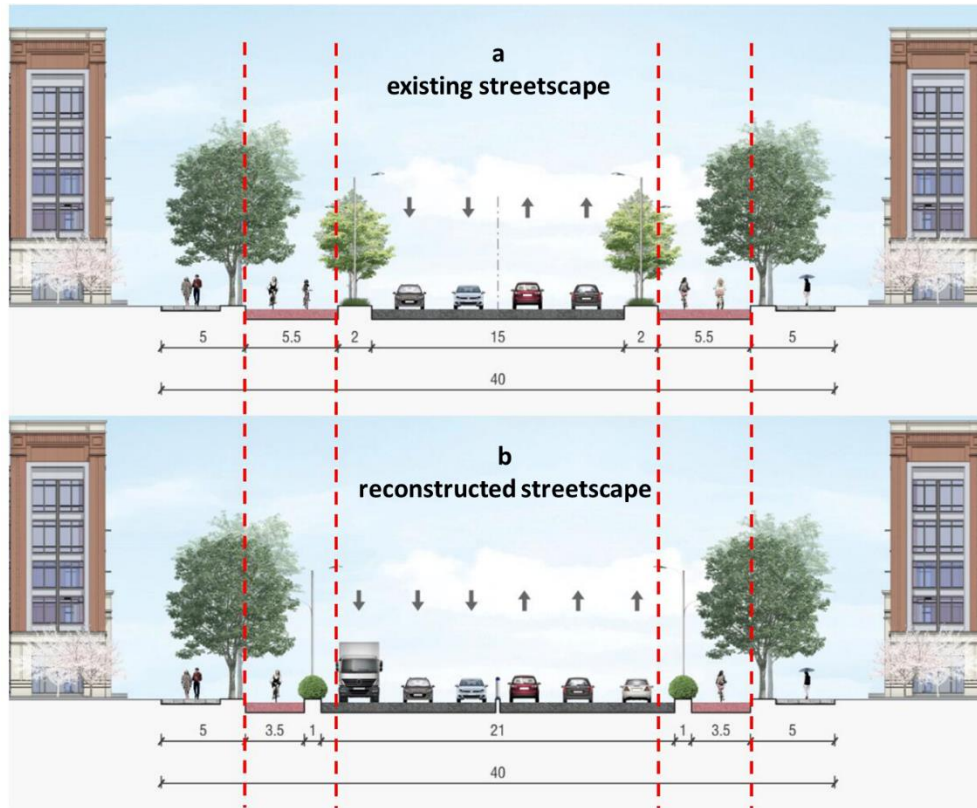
Typical main street reconstruction showing reduced bicycle lane width (unit: m)
